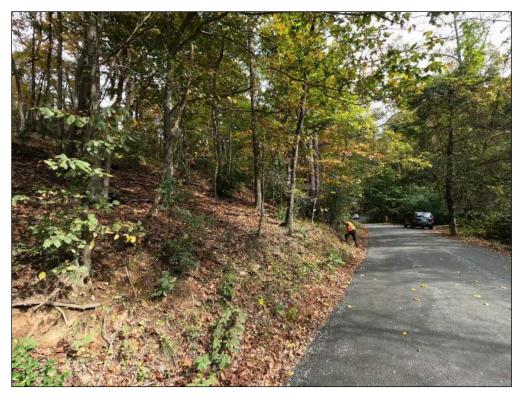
Example of Steep Slopes Along the North Side of Reservoir Road, Facing East.
